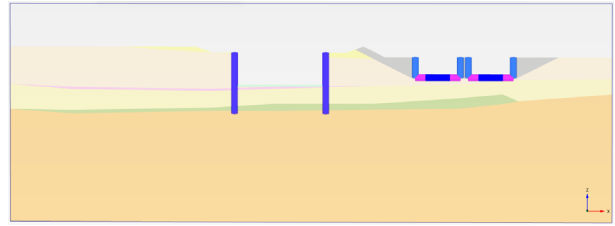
Section B-B crossing the excavation and existing ship lift. Structural elements are blended out.
